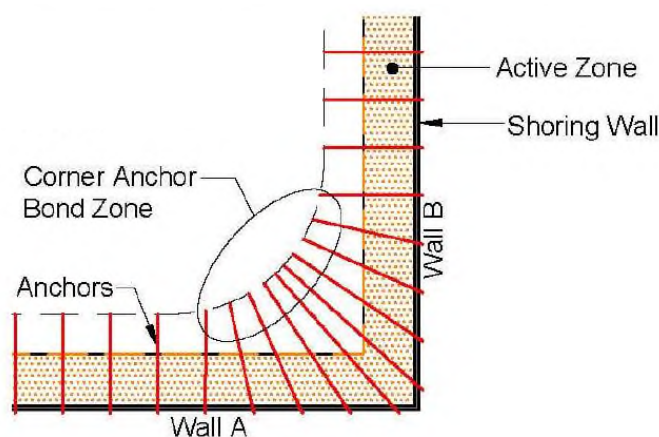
Anchor lengths and placement as implemented in the sheet pile wall corners [22]
